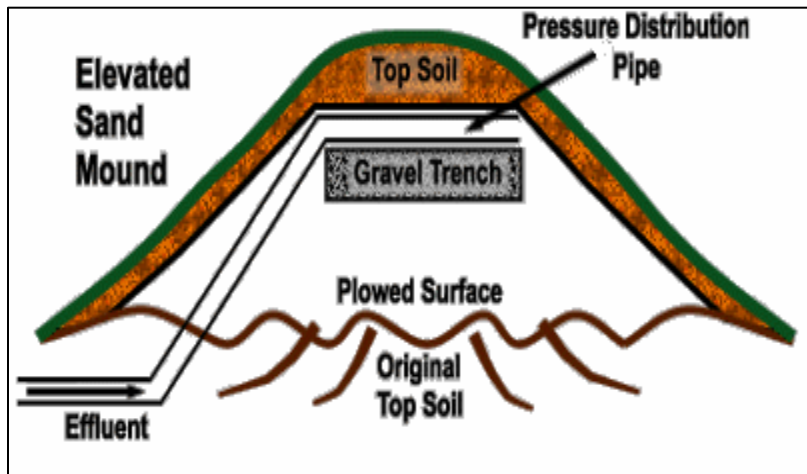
Typical Cross Section of an Elevated Sand Mound System
